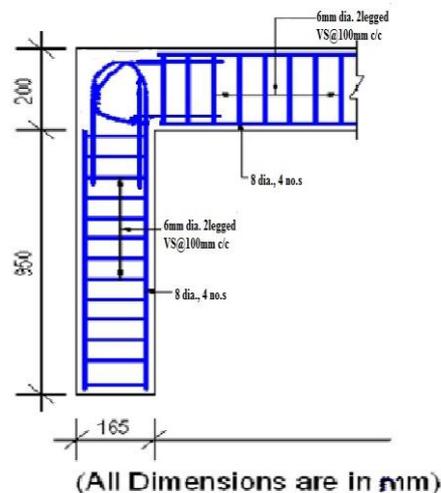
Overlapping U Stirrups type detailing arrangement (SP4)
